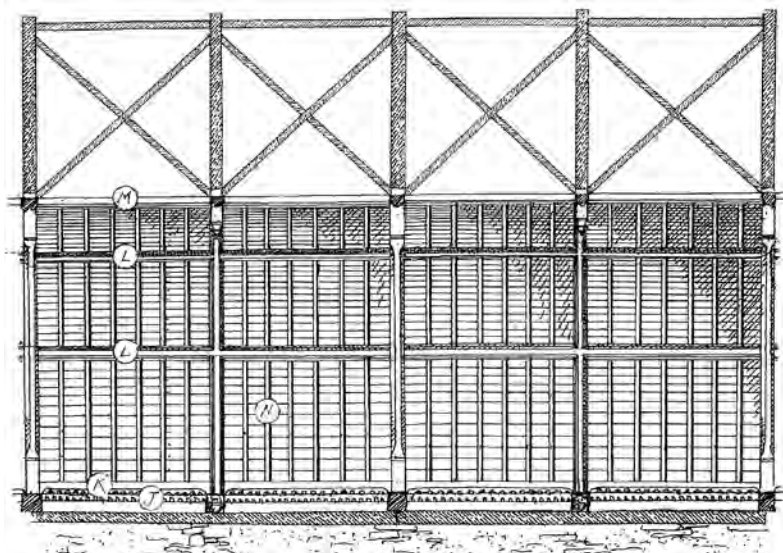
Conjectural partial longitudinal section, Tremblay roof frame.
